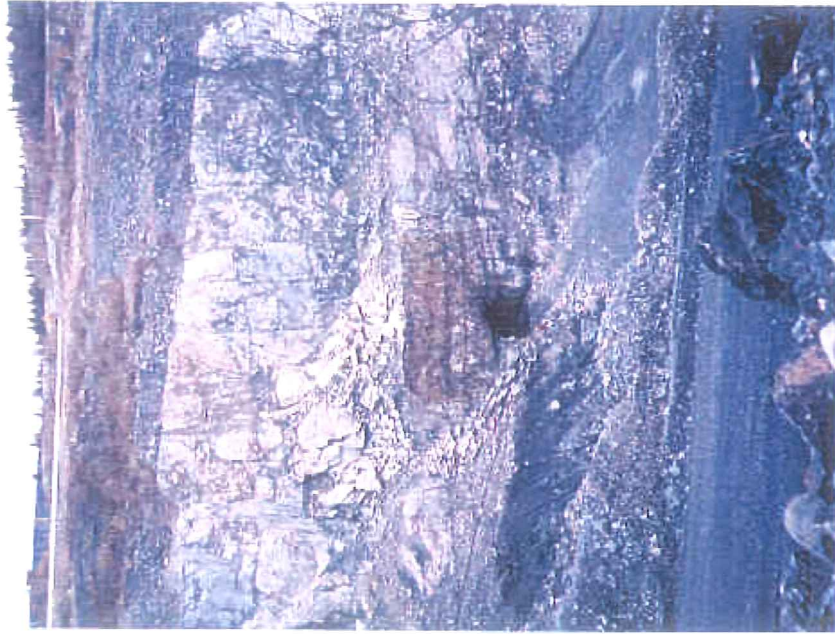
A2 pit, looking south-east towards the portal on the eastern side of the pit.
